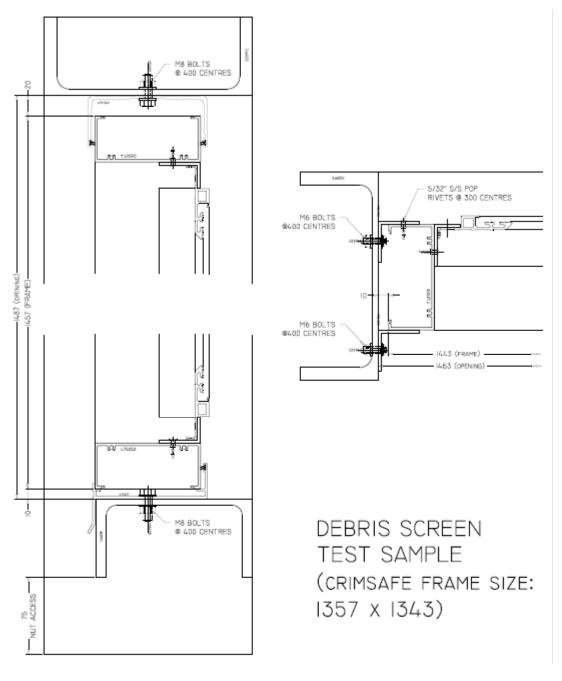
Detail drawing of single layer screen aluminium extrusion frame assembly
